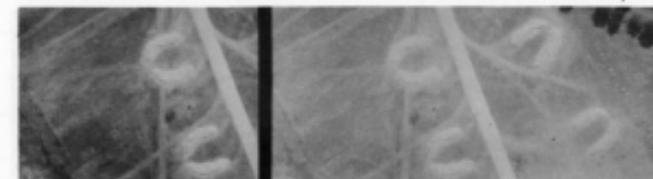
Earthen fighter revetments under construction at Soviet field in Germany. Openings 40 feet.
